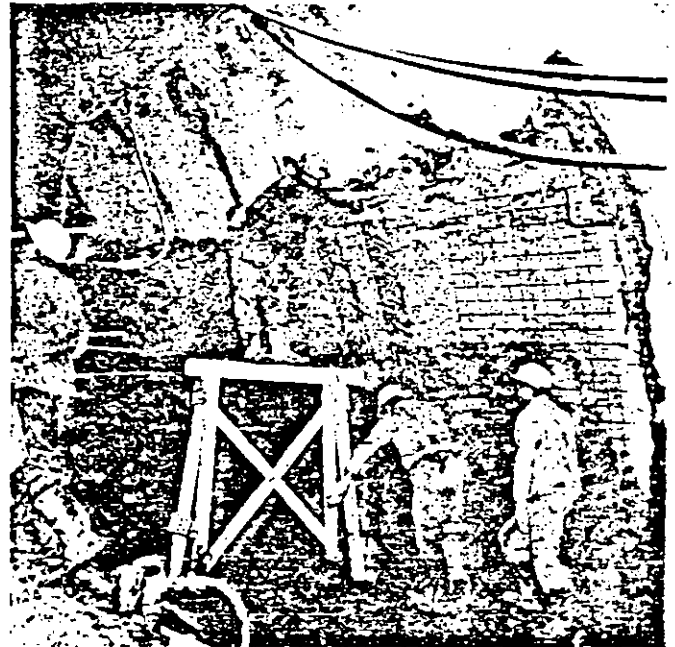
Placing girders and mesh ready for the Shotcrete cover. Note the roof arch which needs no special support
